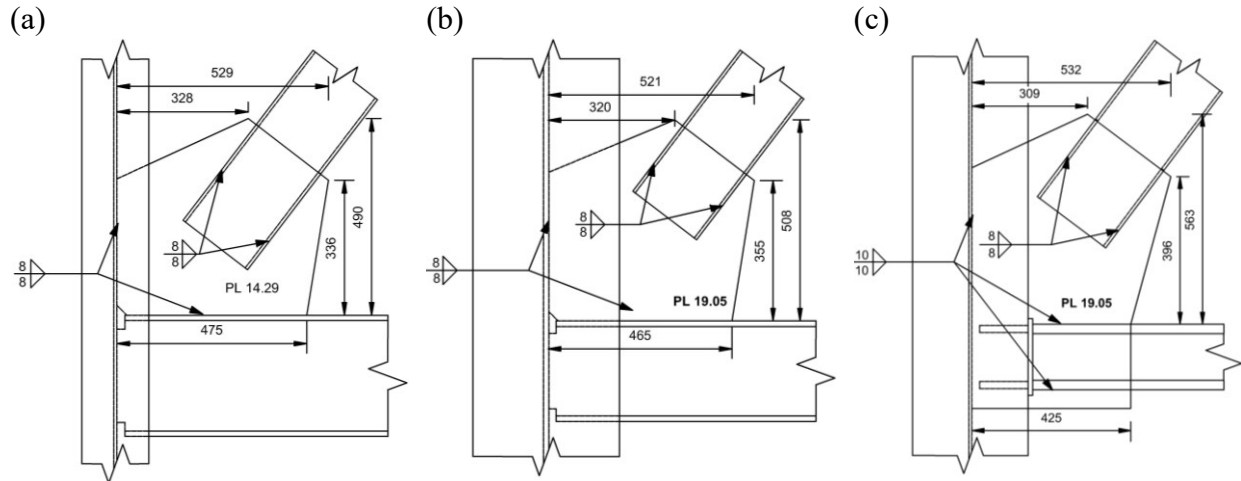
Tier 2 brace gusset plate connections: (a) Specimens 1; (b) Specimen 2; (c) Specimen 3 (dimensions in mm).
